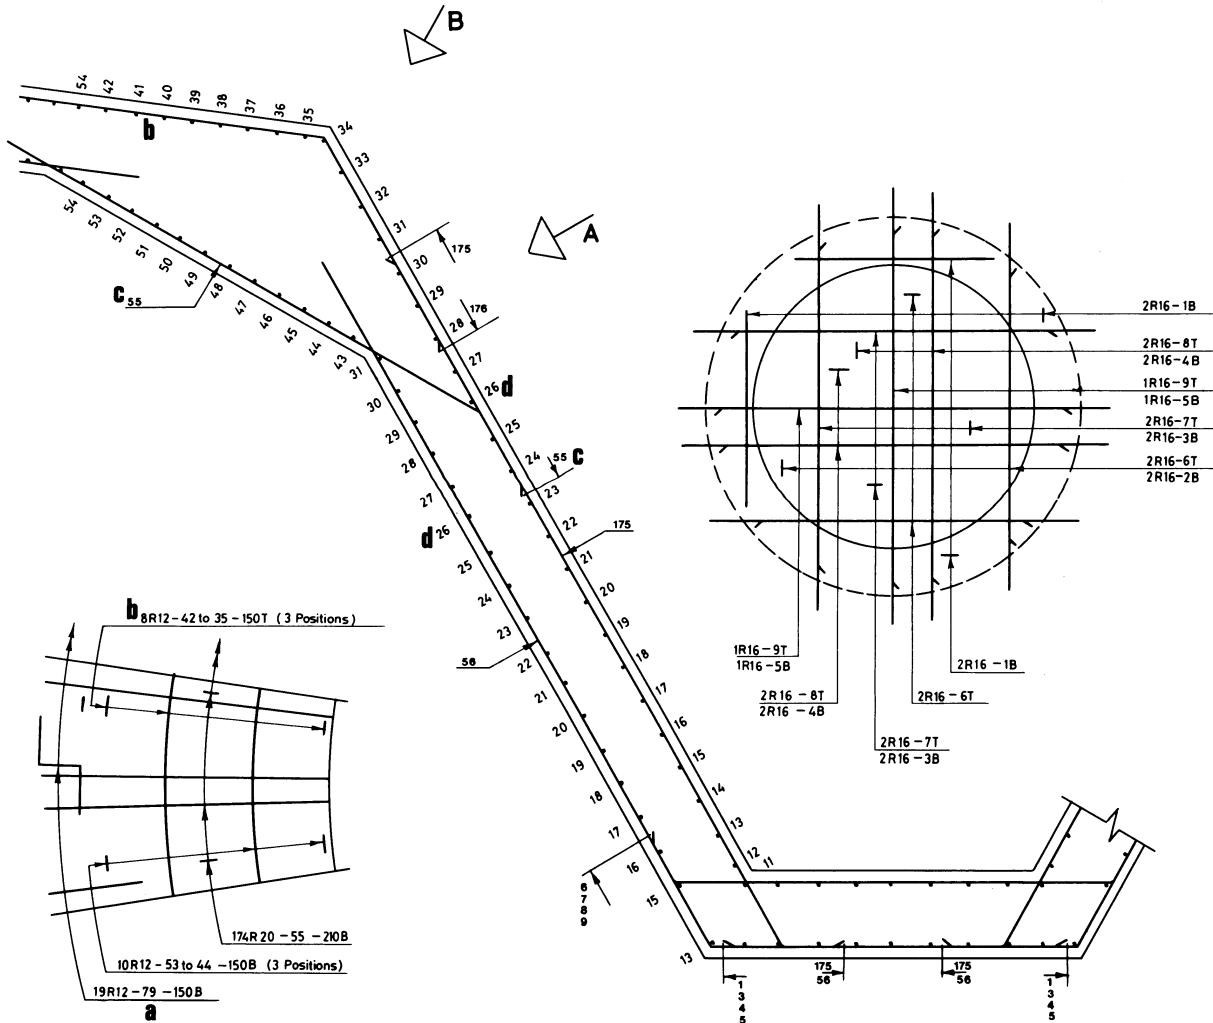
Sedimentation tank – hopper reinforcement detail
